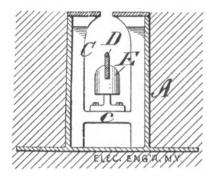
PARKER CONDUIT RAILWAY SYSTEM,
